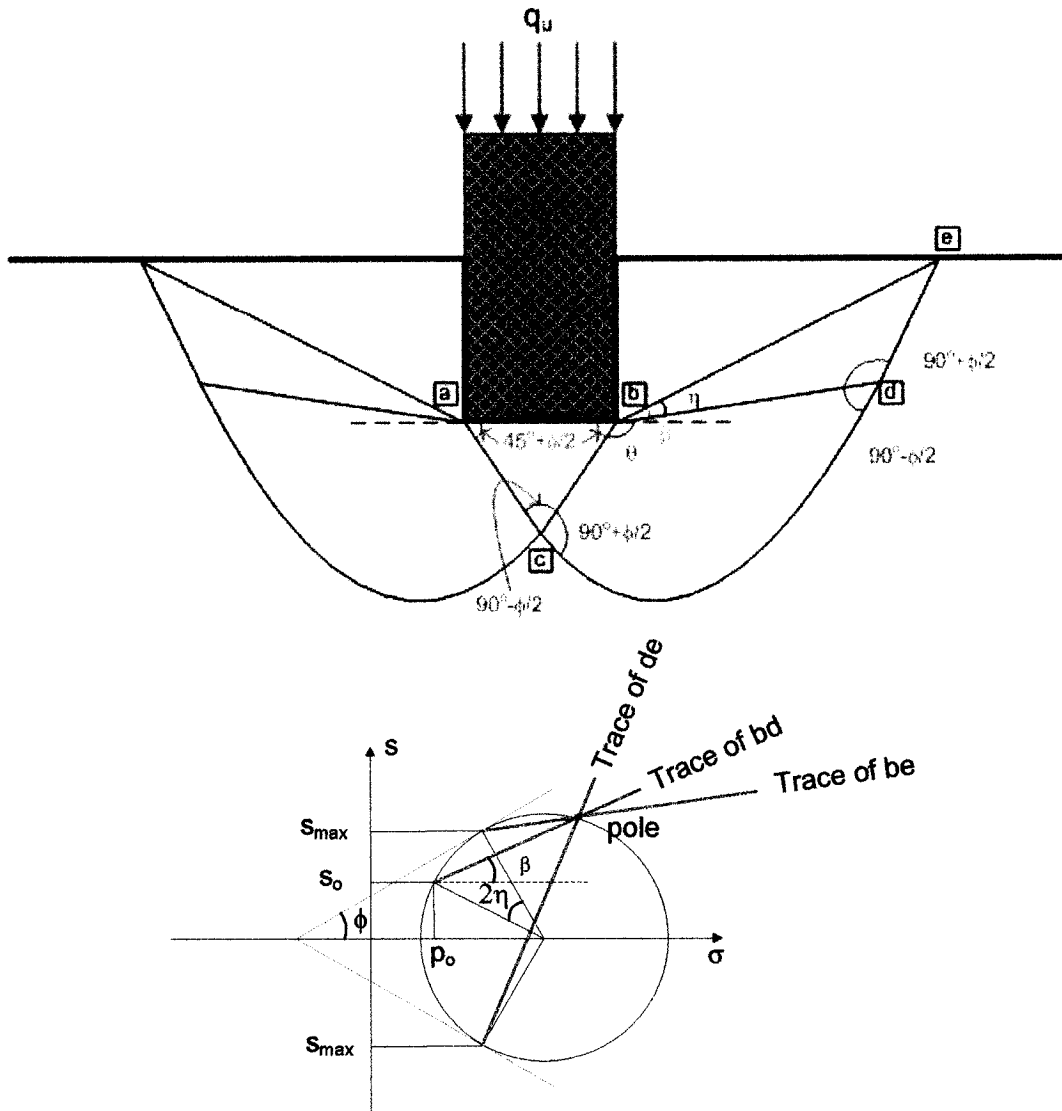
(a) Failure plane of Meyerhof's Theory for Shallow Foundation
